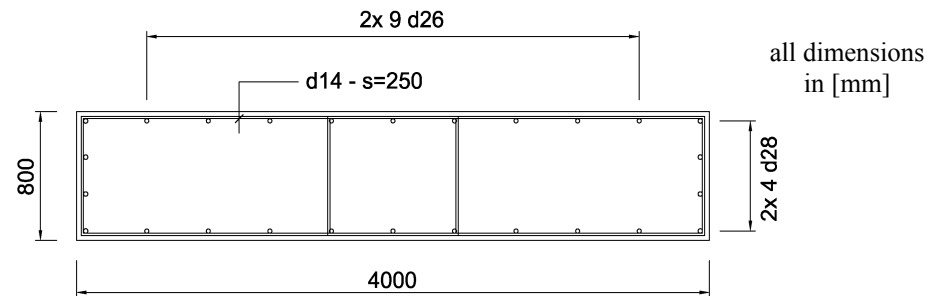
Cross-section of piers P1, P2, and P5 of Viadukt Mühle Rickenbach in SG
